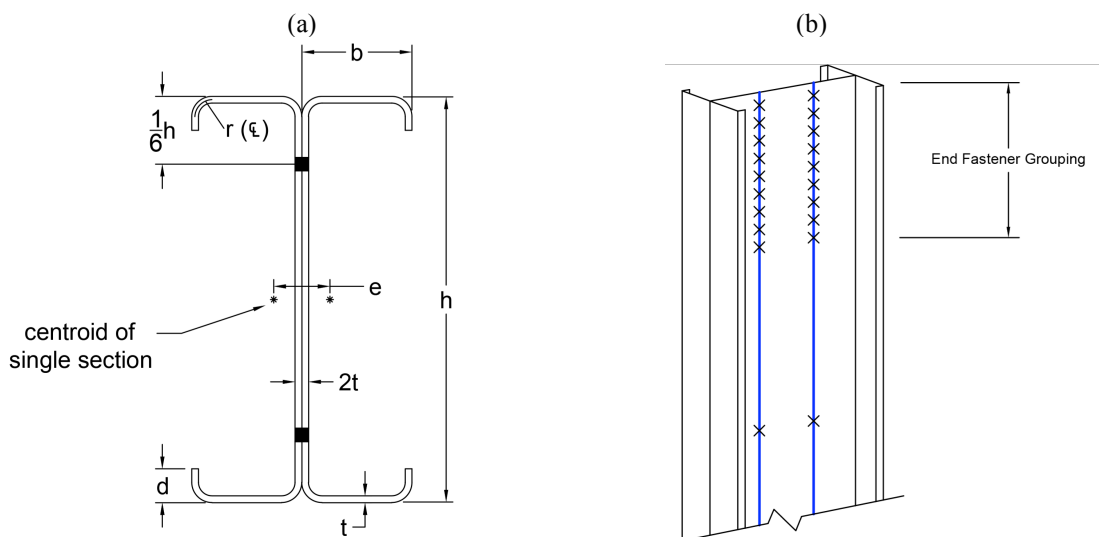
(a) The built-up, back-to-back section studied, showing the location of the web interconnections via screws and (b) an example of the AISI-recommended fastener layout at the column ends
